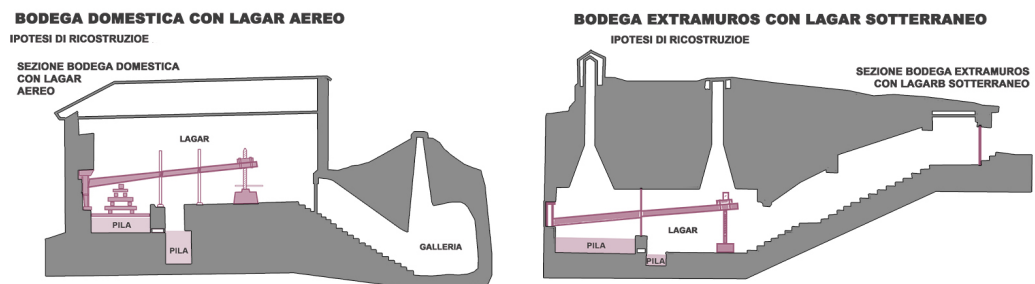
Ideal reconstruction of domestic bodega with above-ground or underground lagar. Graphic design by Antonella Murolo.
